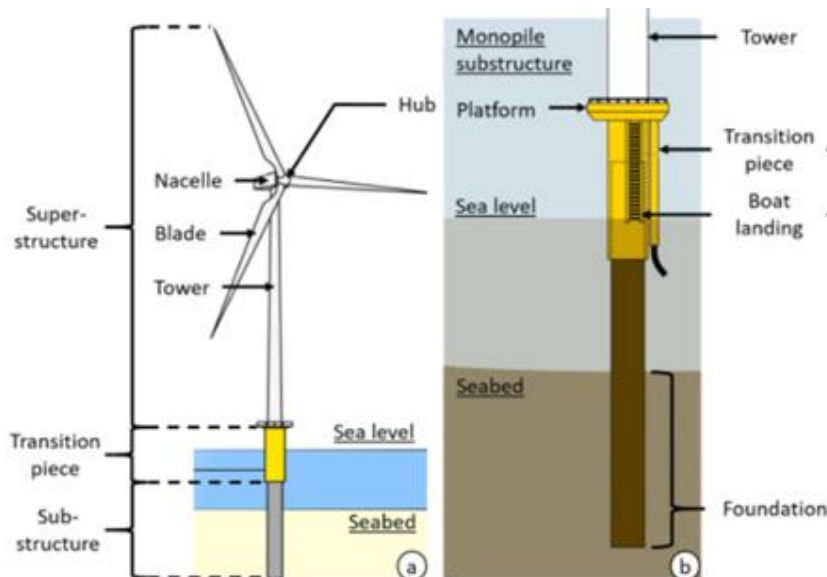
Monopile WTG Foundation and substructure. [26]
